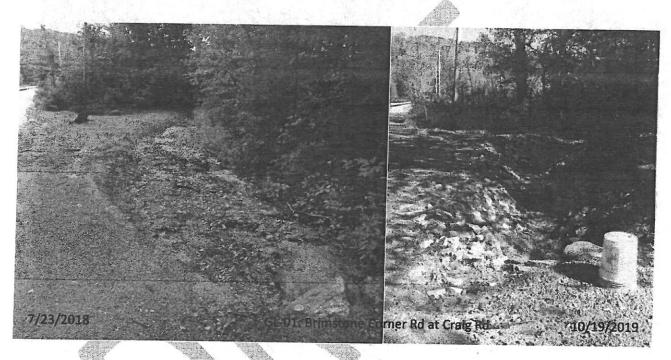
Erosion Site 01 at the intersection of Brimstone Corner Road, Craig Road and Gregg Lake Road, where stormwater runoff carries sediment down a steep section of Brimstone Corner Road and deposits it directly into Gregg Lake. Photos taken at the outlet of the culvert under Harbor Road looking towards Gregg Lake before (left) and after (right) installation of uphill turnouts and diversion dams, lining ditches, crowning, stabilizing road shoulders and installing a catch basin.
